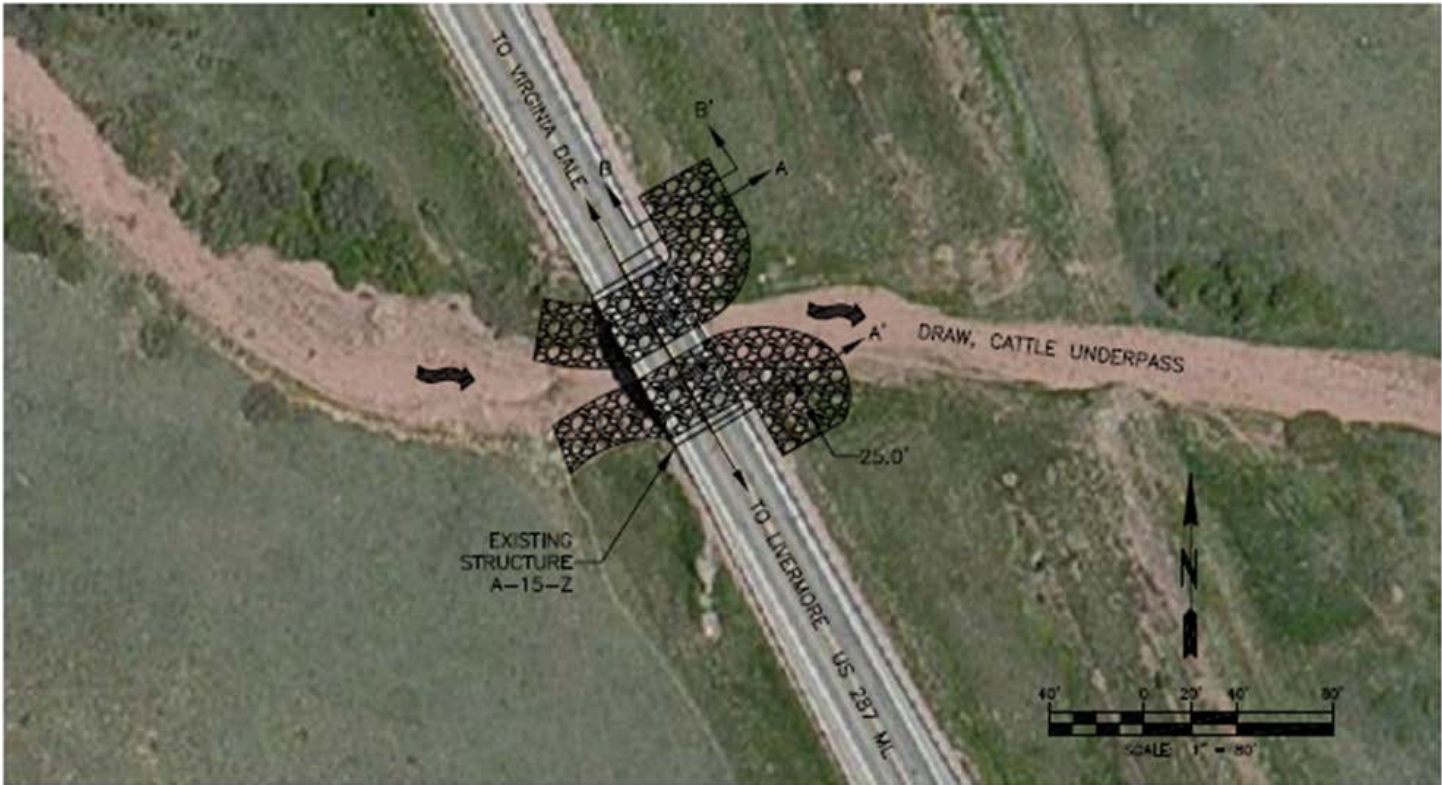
Plan view of Bridge A-15-Z with recommended hydraulic scour countermeasure locations
